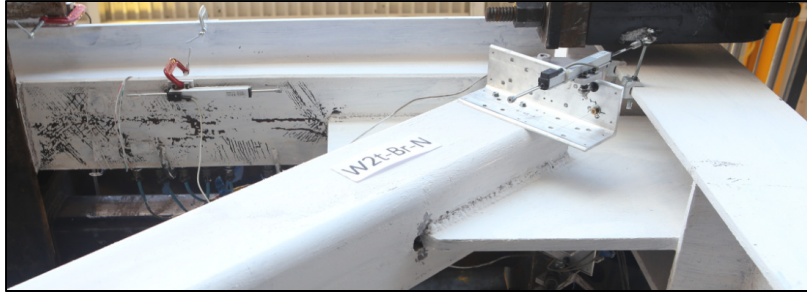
Final damage state of upper second-story east brace connection: whitewash flaking at lower flange of beam, net reduced section region of brace, and at flanges of column.
